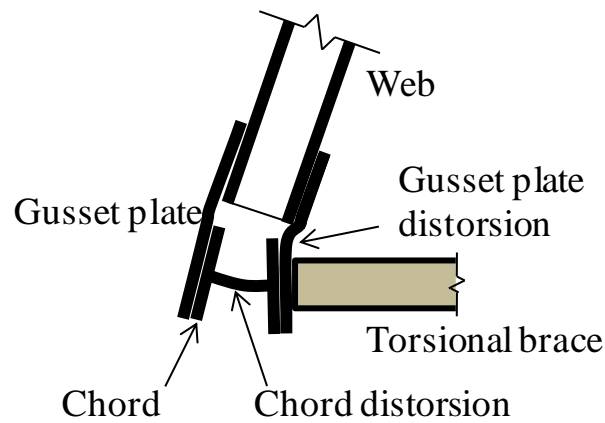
Cross section distortion at brace connection due to stiff torsional brace
